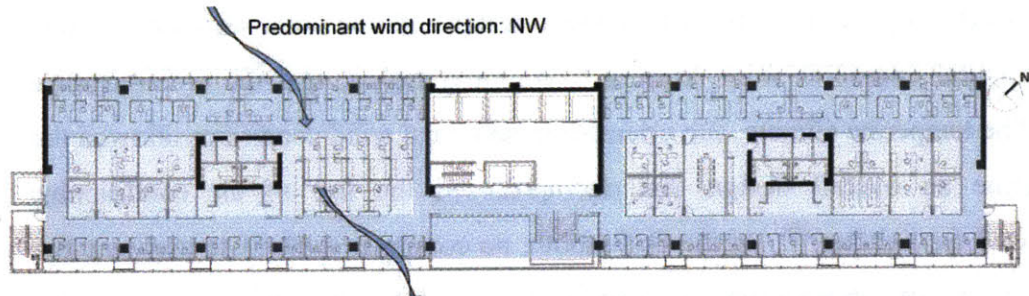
Plan of a typical floor. The building is 122m long and 19m wide.
